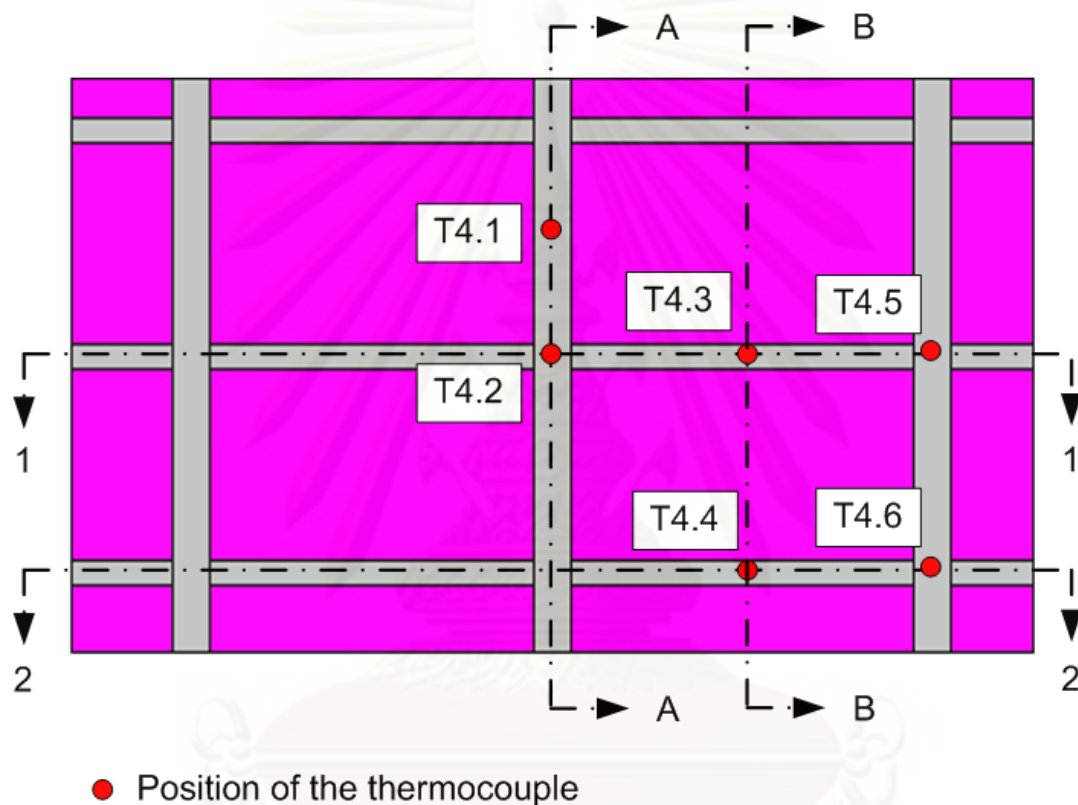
Locations of thermocouples at the unexposed face of the gypsum board assembly
